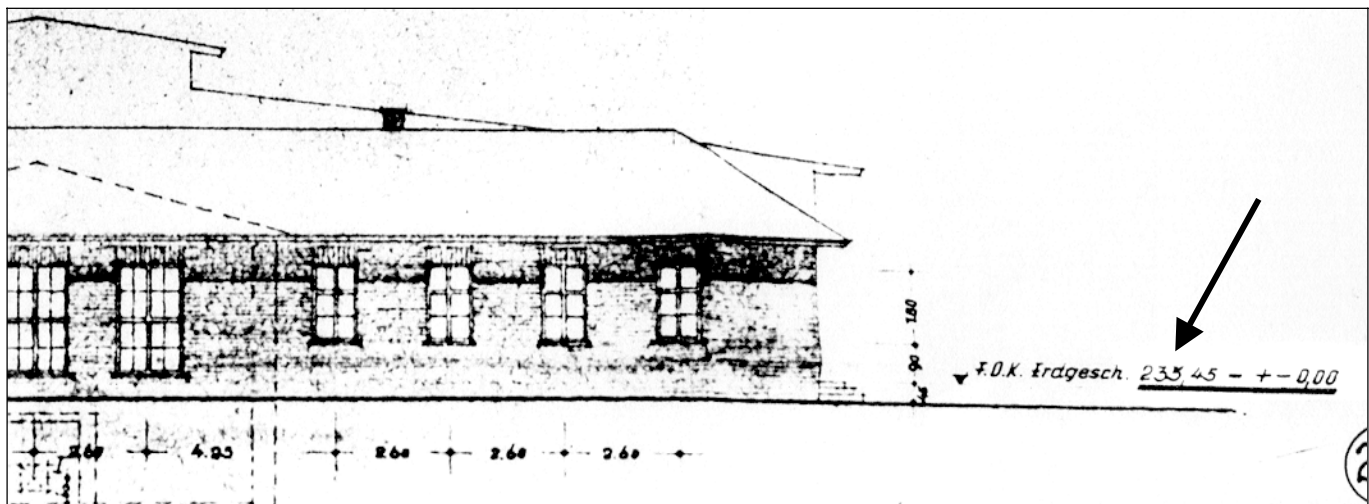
Enlargement of the detail from the building plan for the “water treatment facility of the POW camp.” Auschwitz-Birkenau, TCIDK 502-2-148. The elevation of the construction site above sea level is clearly marked (arrow).
